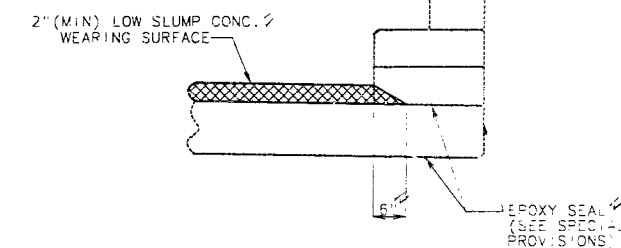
DETAIL OF TRANSVERSE JT. NEAR BT. NO. 4
